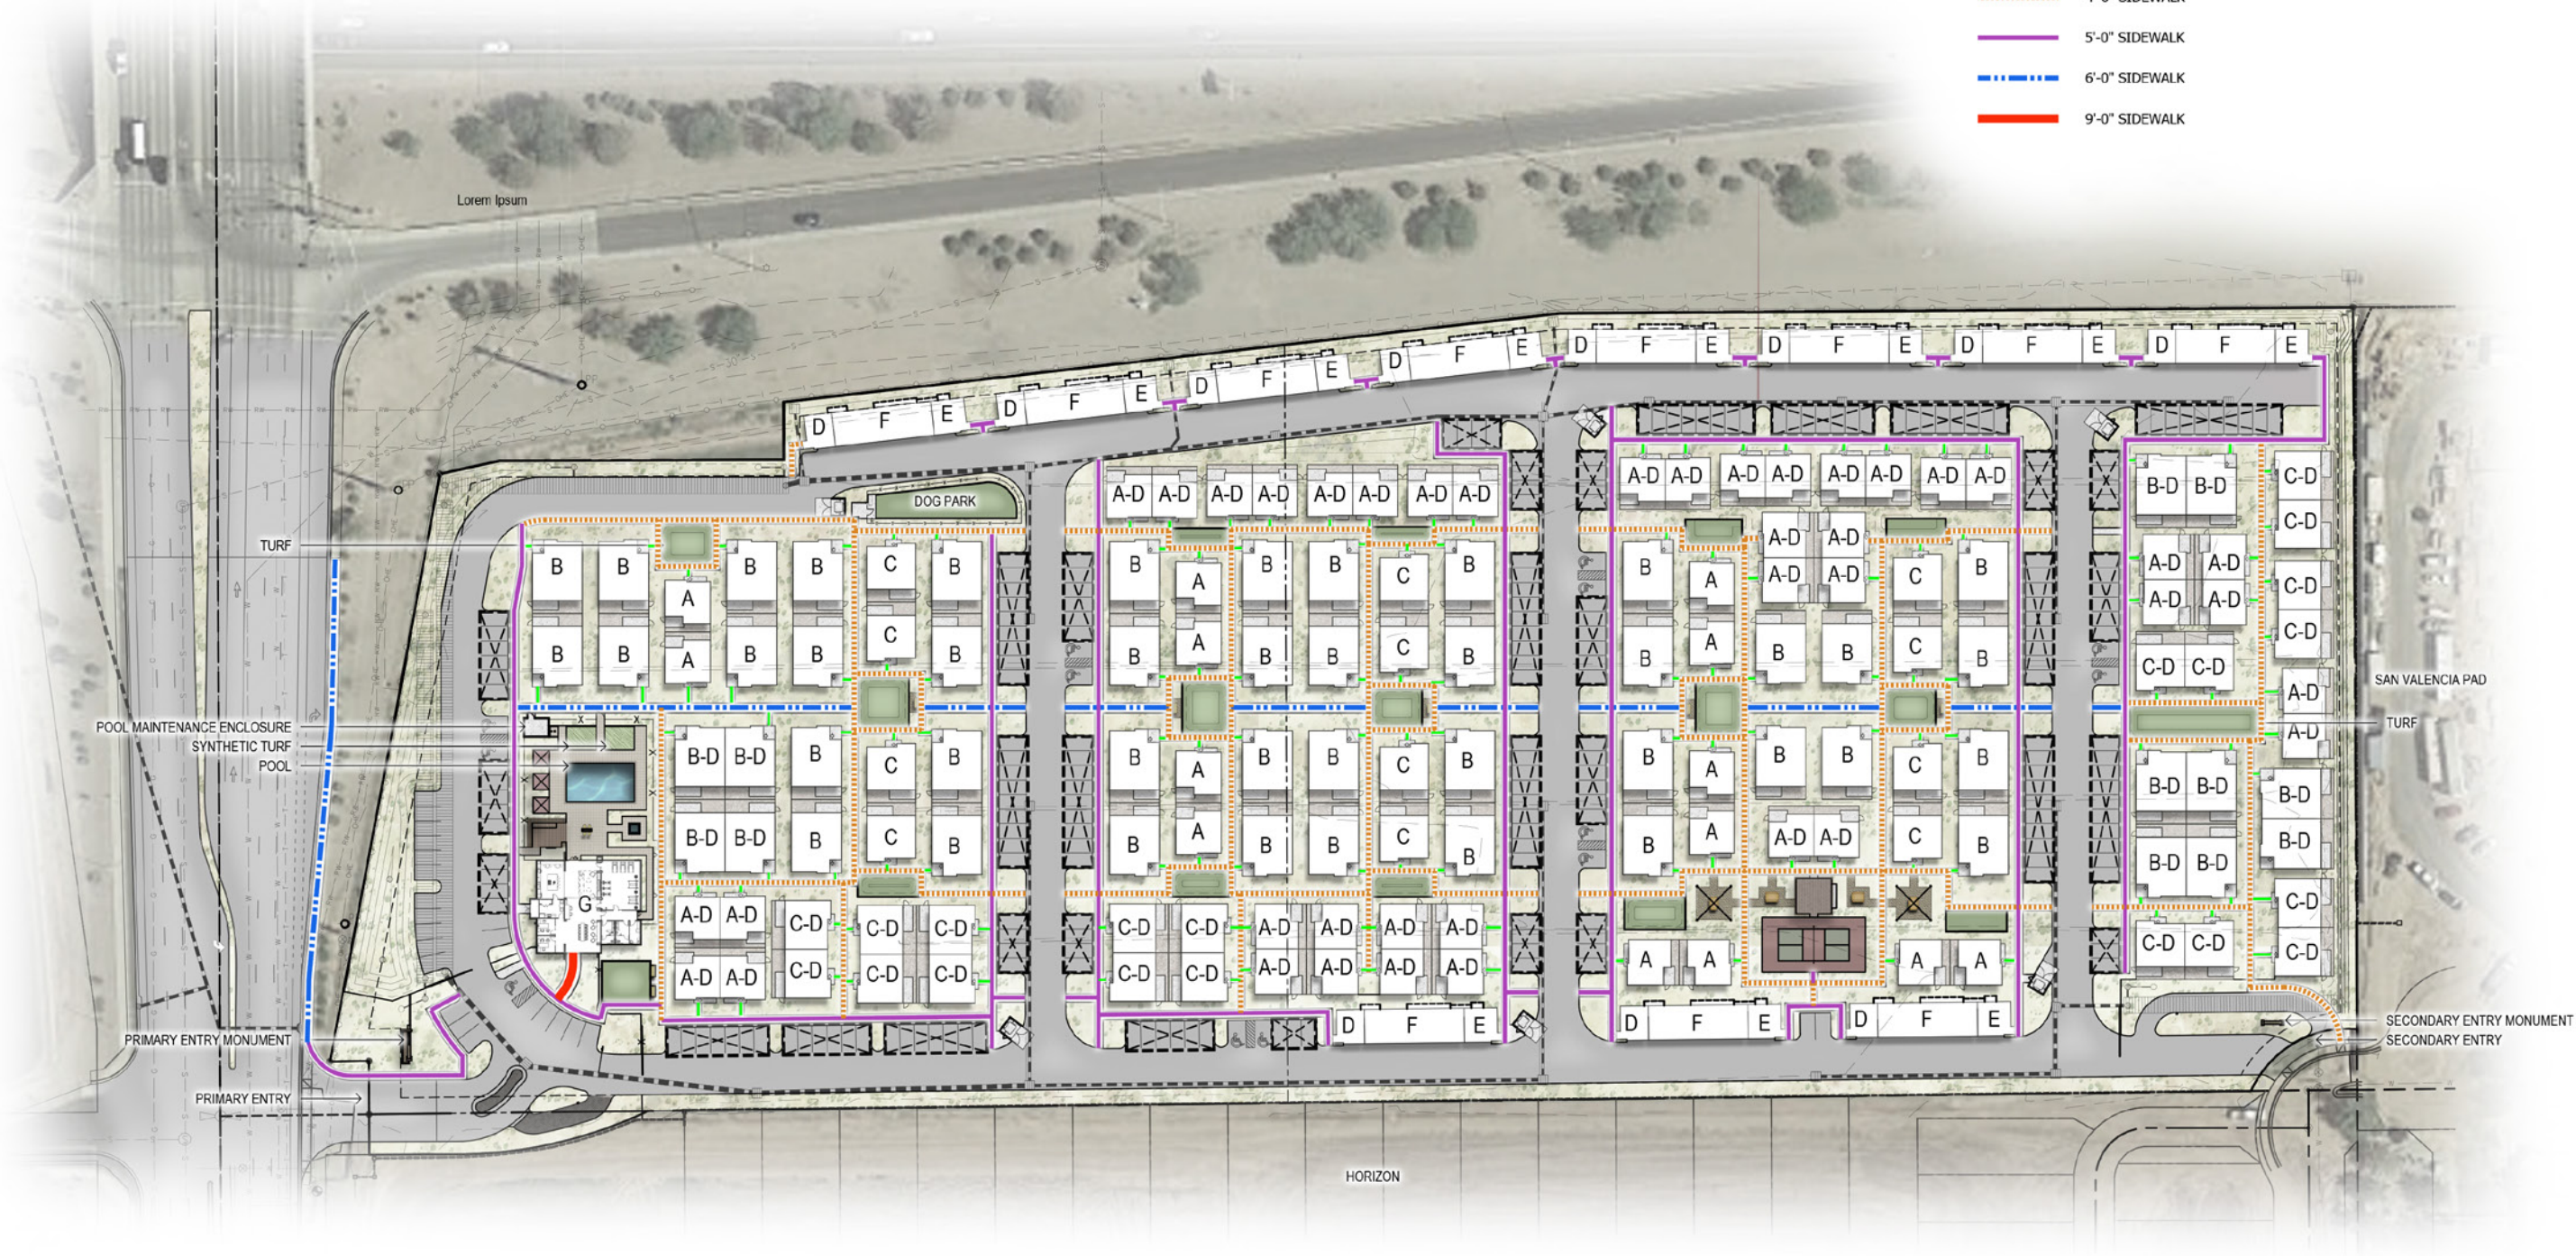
EXHIBIT I: PEDESTRIAN CIRCULATION PLAN
